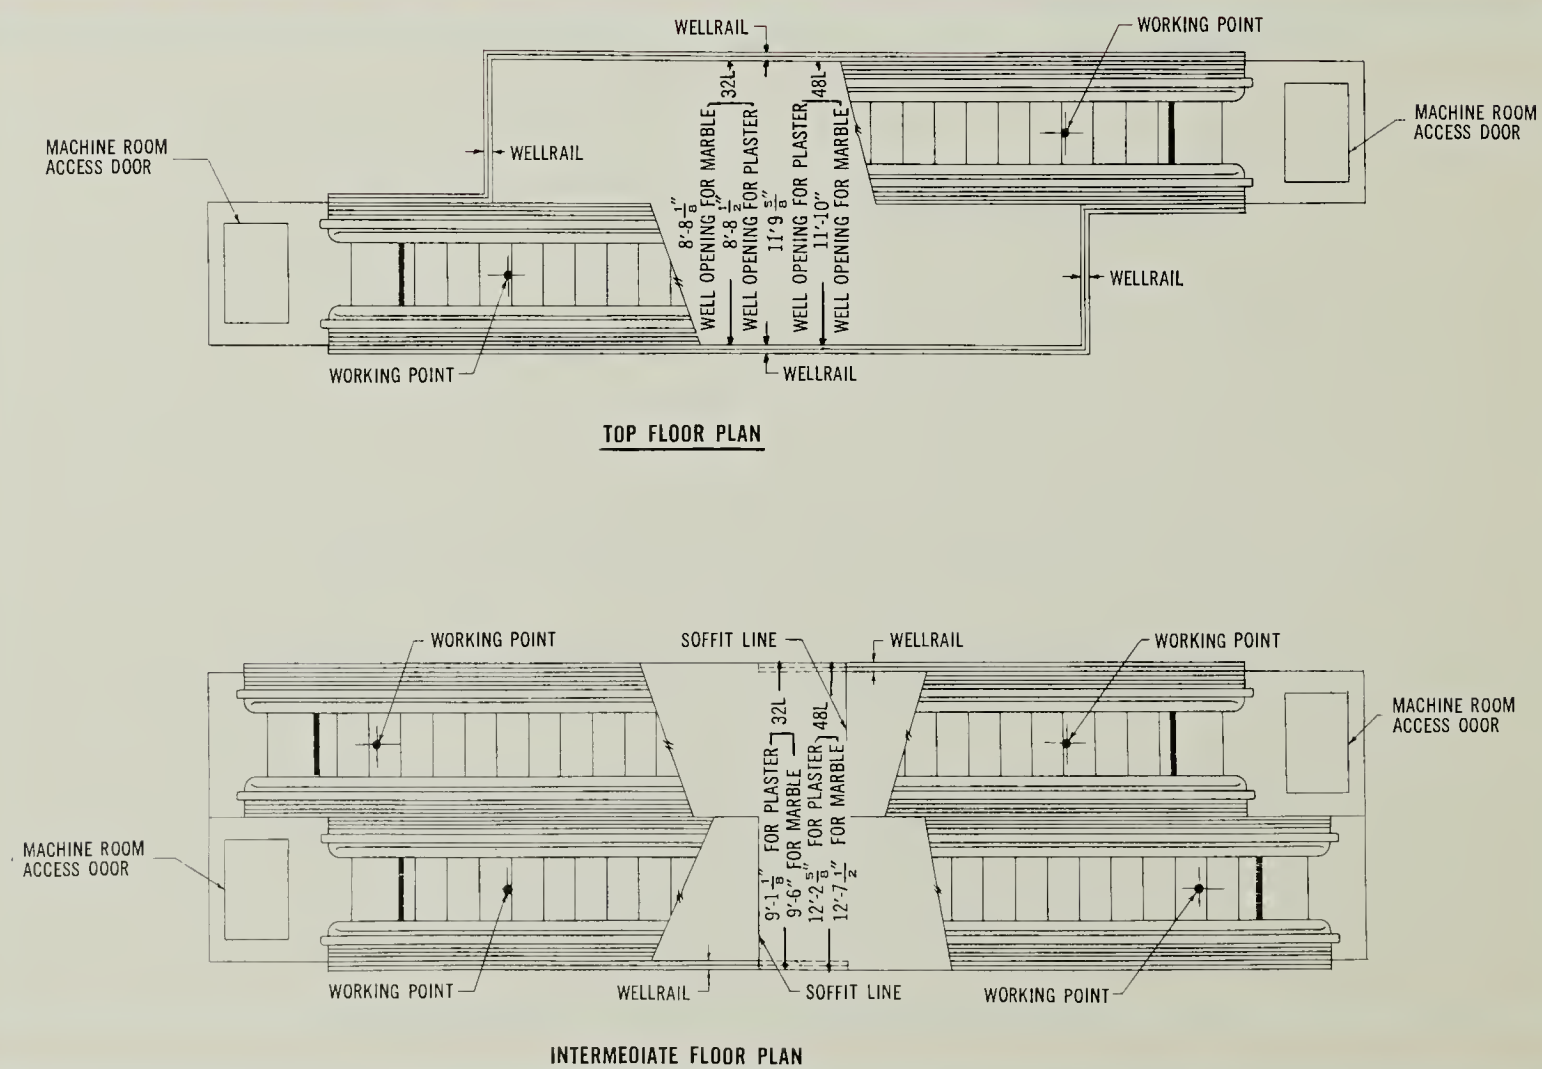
Criss-Cross Arrangement-Wellway Railing Plan
